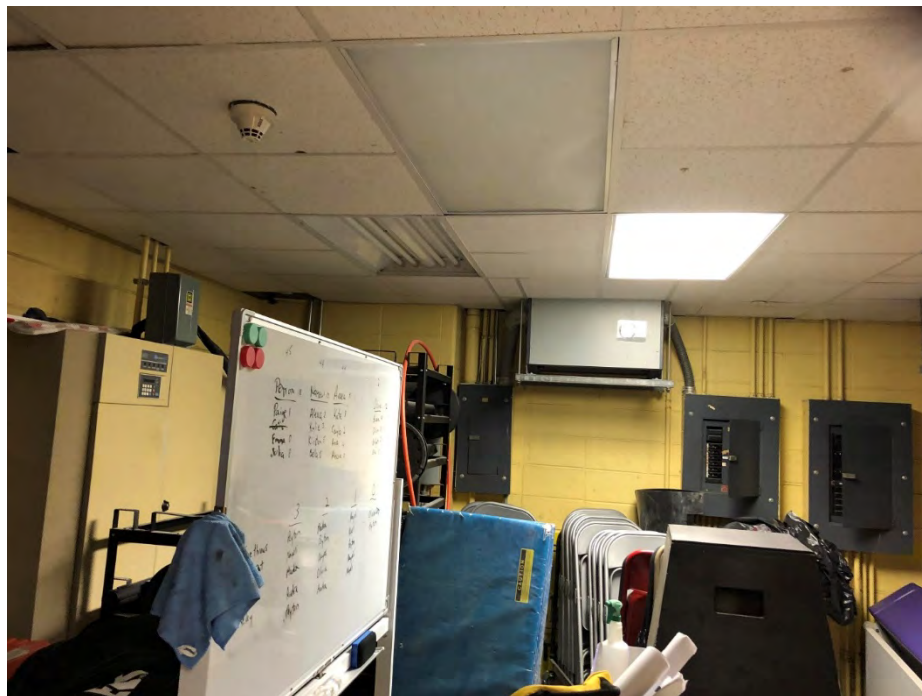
Central Emergency Lighting Inverter System and Electrical Distribution System Located in Storage Room Adjacent to Gym in Building 2
